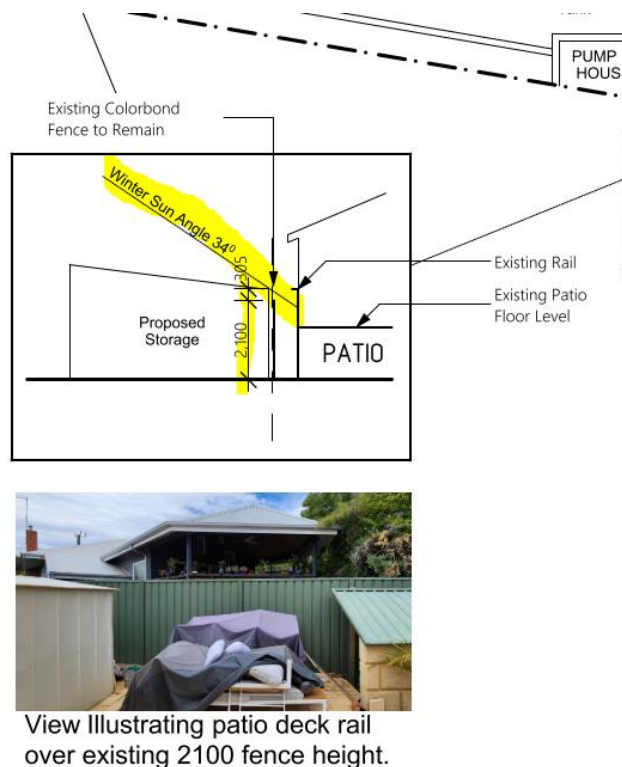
Sun Angle to southern adjoining property (3 Collick Street) from proposed outbuilding and view toward existing patio deck at southern adjoining property.
